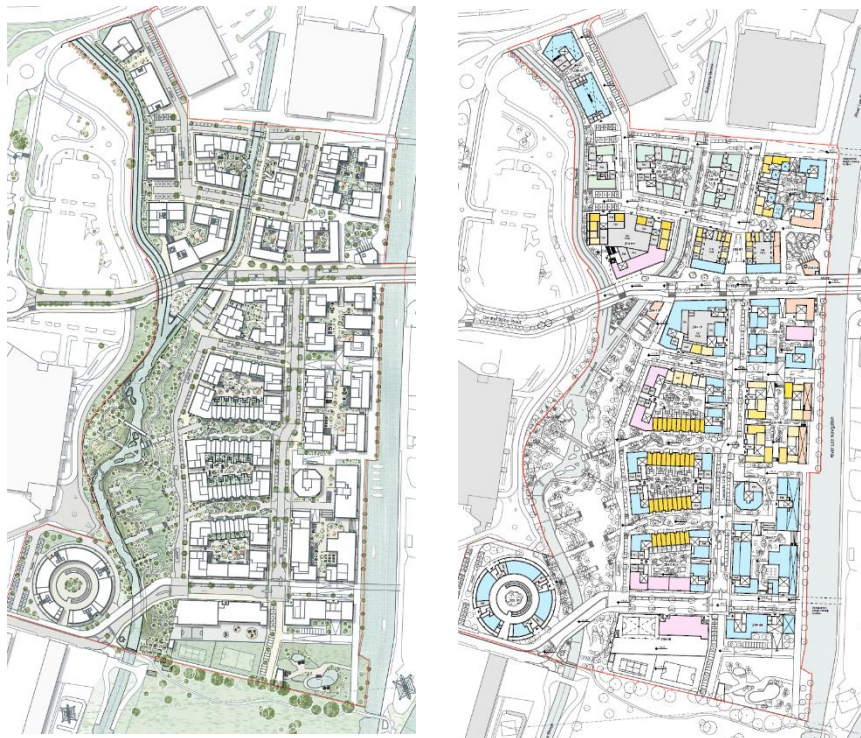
Phase2 illustrative plan (left) ground floor illustrative plan (right)
